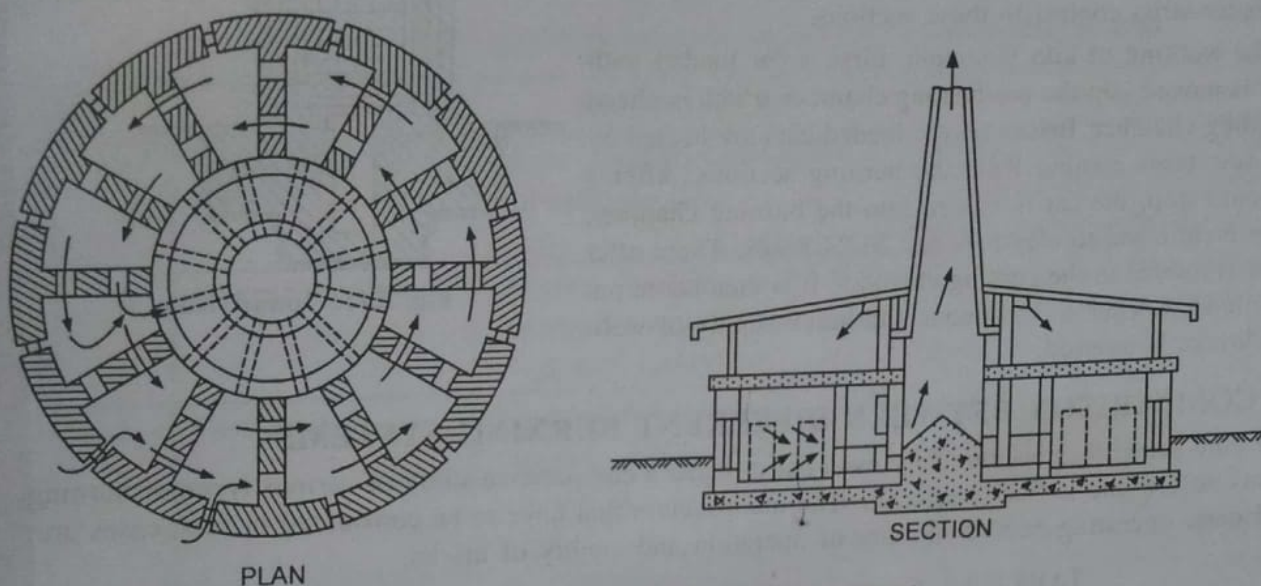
Hoffman's kiln (a) Plan (b) Section.
